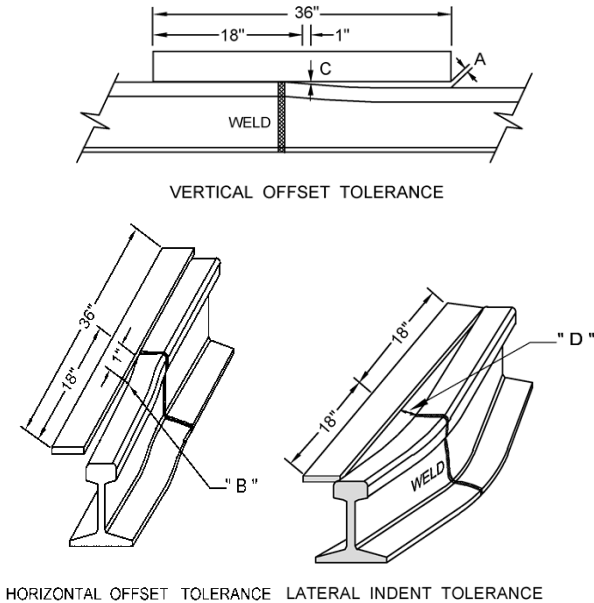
Weld Grinding Tolerance Diagrams
